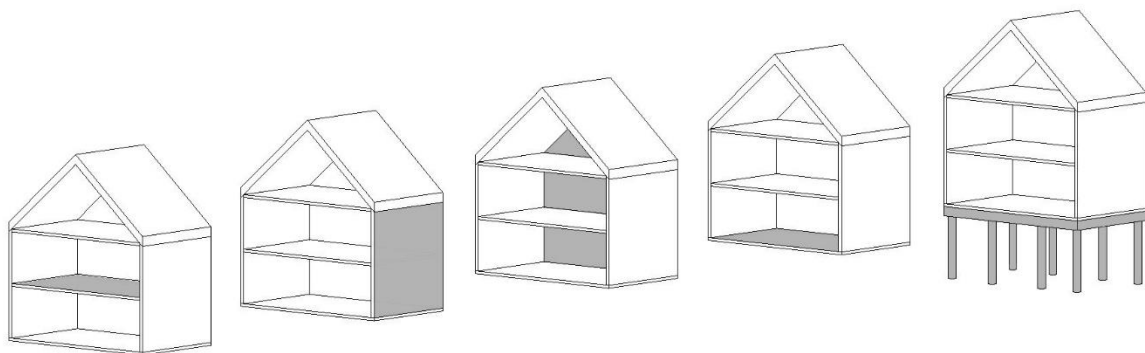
INTERMEDIATE FLOOR, FACDE WALL, LOADBearing WALL, GROUND FLOOR AND FOUNDATION
